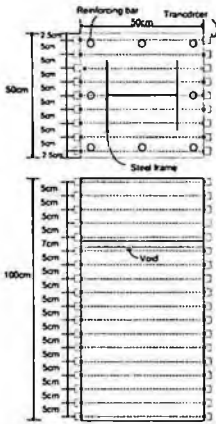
SRC structure column specimen (plane-shaped joint voids)
